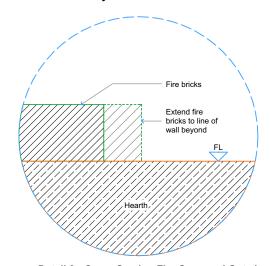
Cross Section Fire Surround Opt. 3 Timber Cavity
